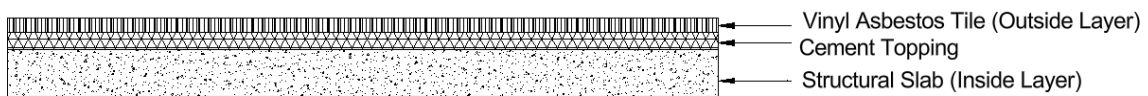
The Construction Design for the Montpetit Hall Interior Floor
